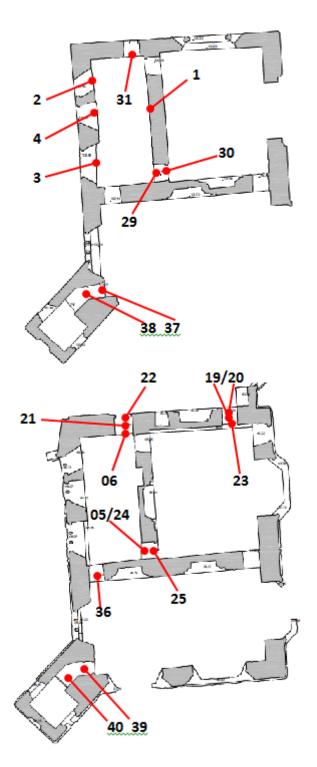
/b: Plans of the building to help locate sampled timbers (after Purcell Miller Tritton)
